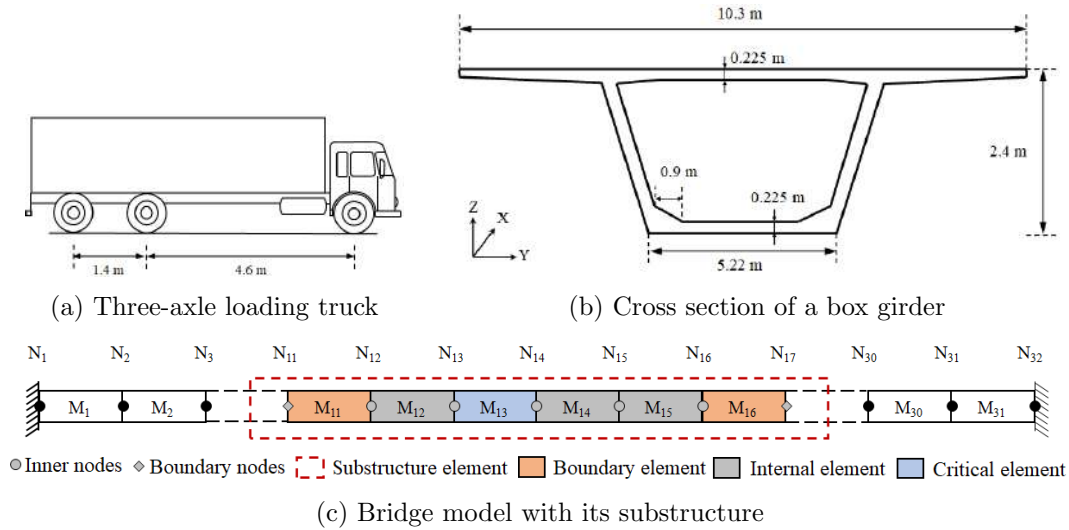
Schematic diagram of a box girder bridge model with its substructure used in numerical verification.
